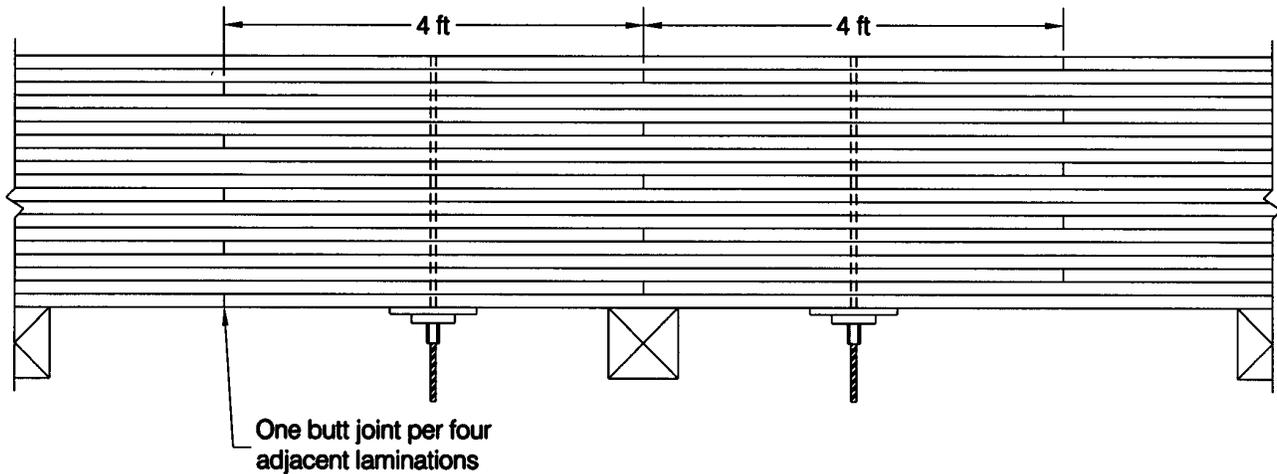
Butt joint configuration used for the Little Salmon Creek bridge. A butt joint was placed transversely to the bridge span in every fourth lamination. Longitudinally, butt joints in adjacent laminations were separated by 4 ft.
